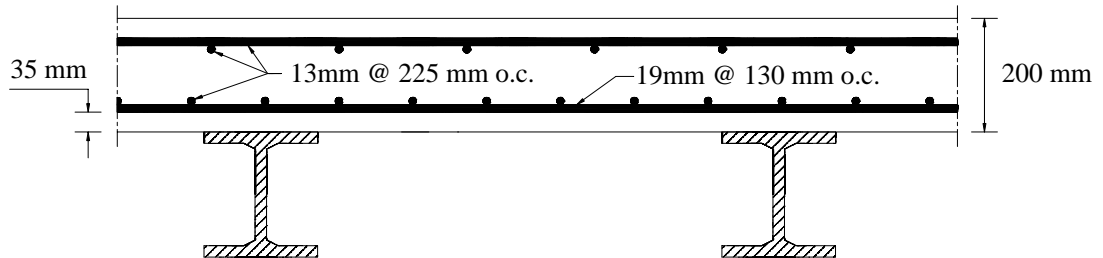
FRP Reinforcement for GFRP-Reinforced Bridge Deck Slab Example.
